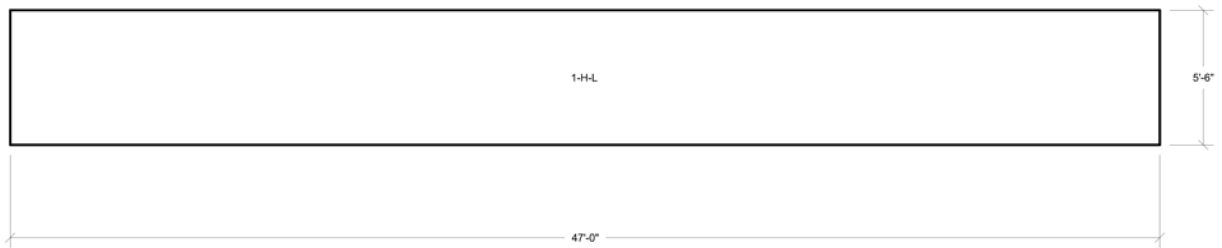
H.7-15 Tunnel and Access Region Basemat Looking Down Horizontal Reinforcement Zones Near Side and Far Side Faces
